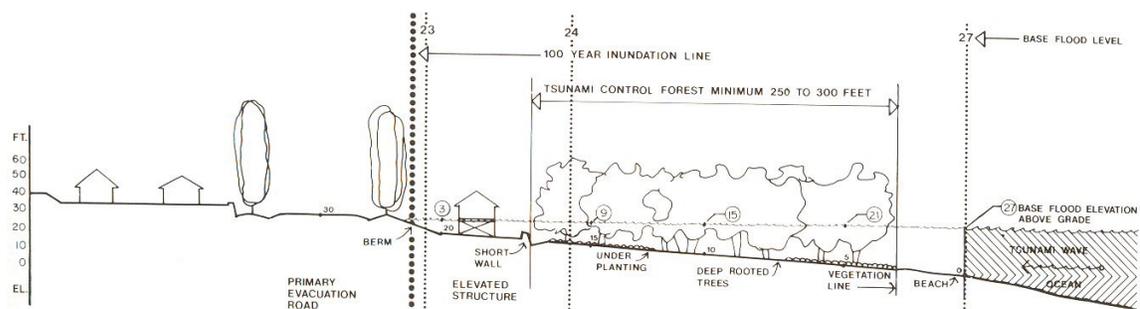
Siteplan concept section of Kodiak Island, Alaska. It shows combination of siteplan techniques in avoiding, slowing, steering, and blocking tsunami waves by incorporating the tsunami control forest, elevated construction, drainage canal, and evacuation road (Preuss, 1983)
